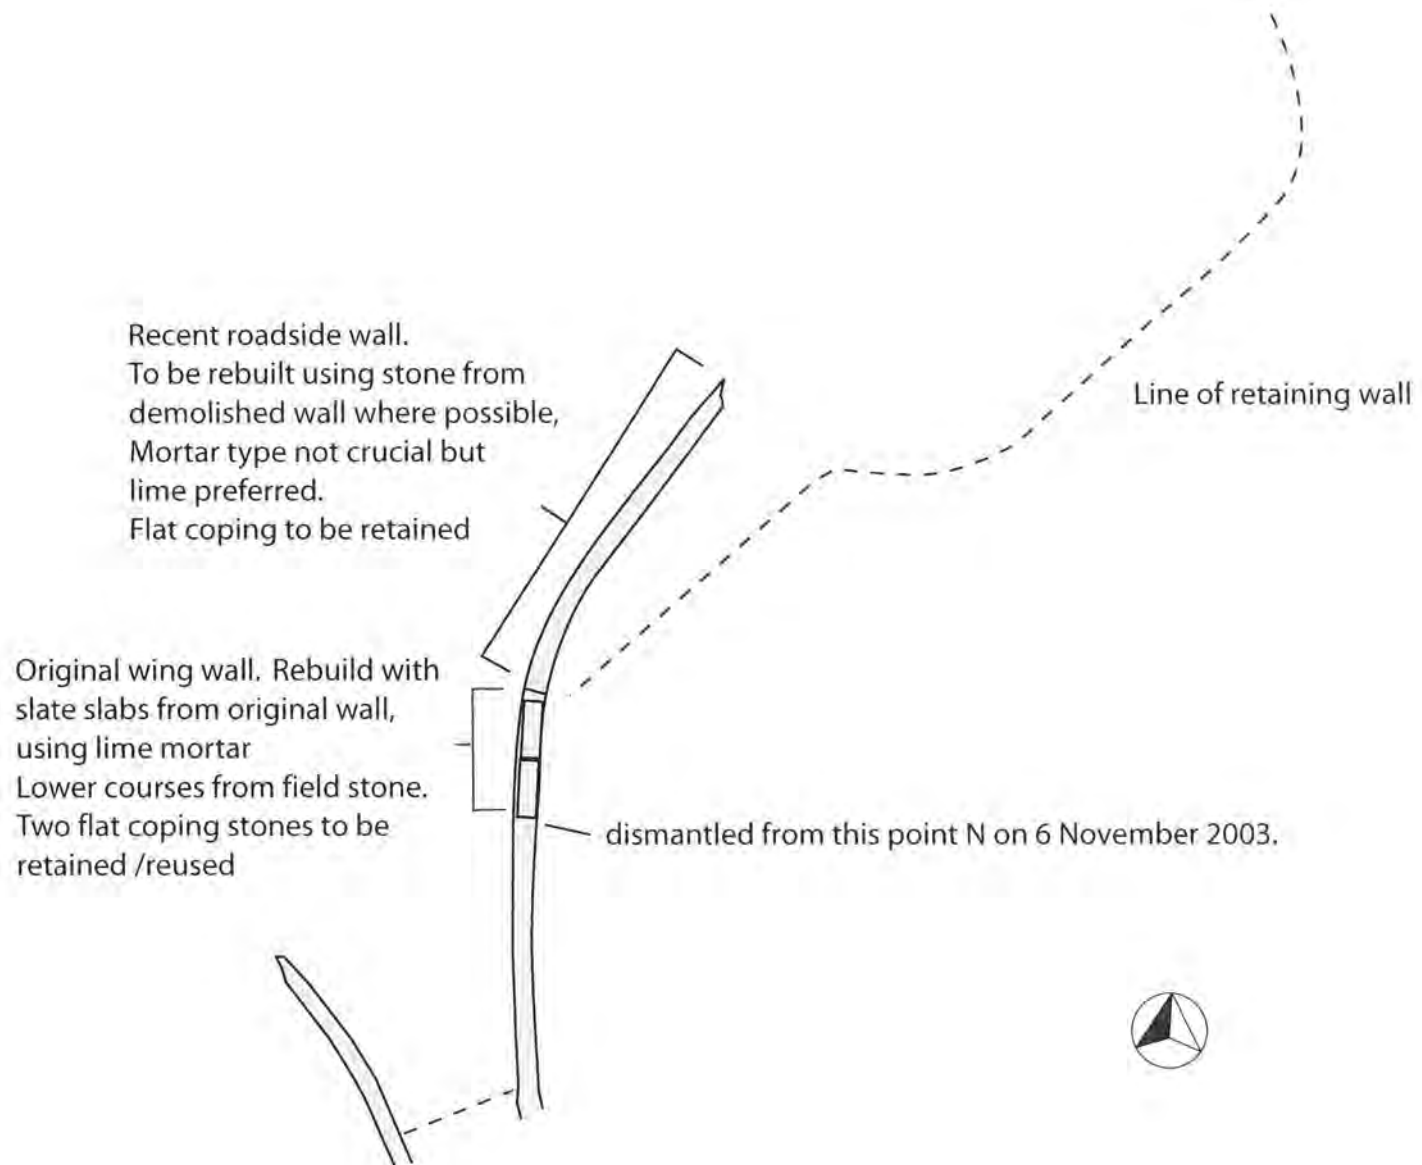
Pont-ar-Lledr, sketch plan at 1:200 showing mitigatory recommendations
